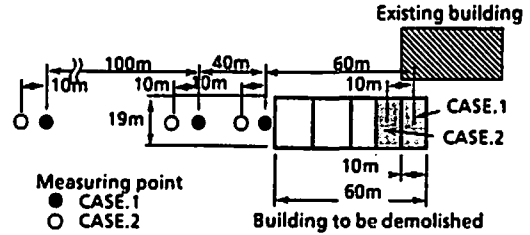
Plan of demolition site (CASE 1, CASE 2)
